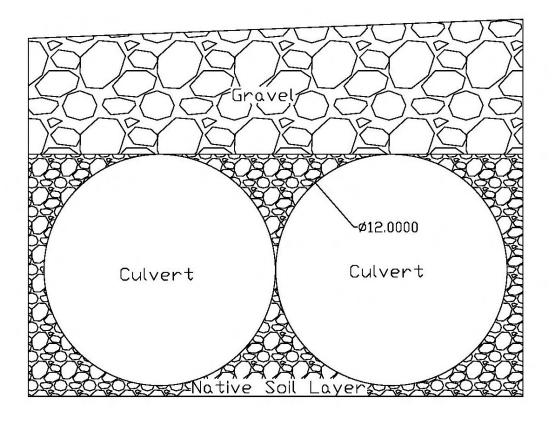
Cross-Section Drawing for Proposed Perimeter Road Culvert
